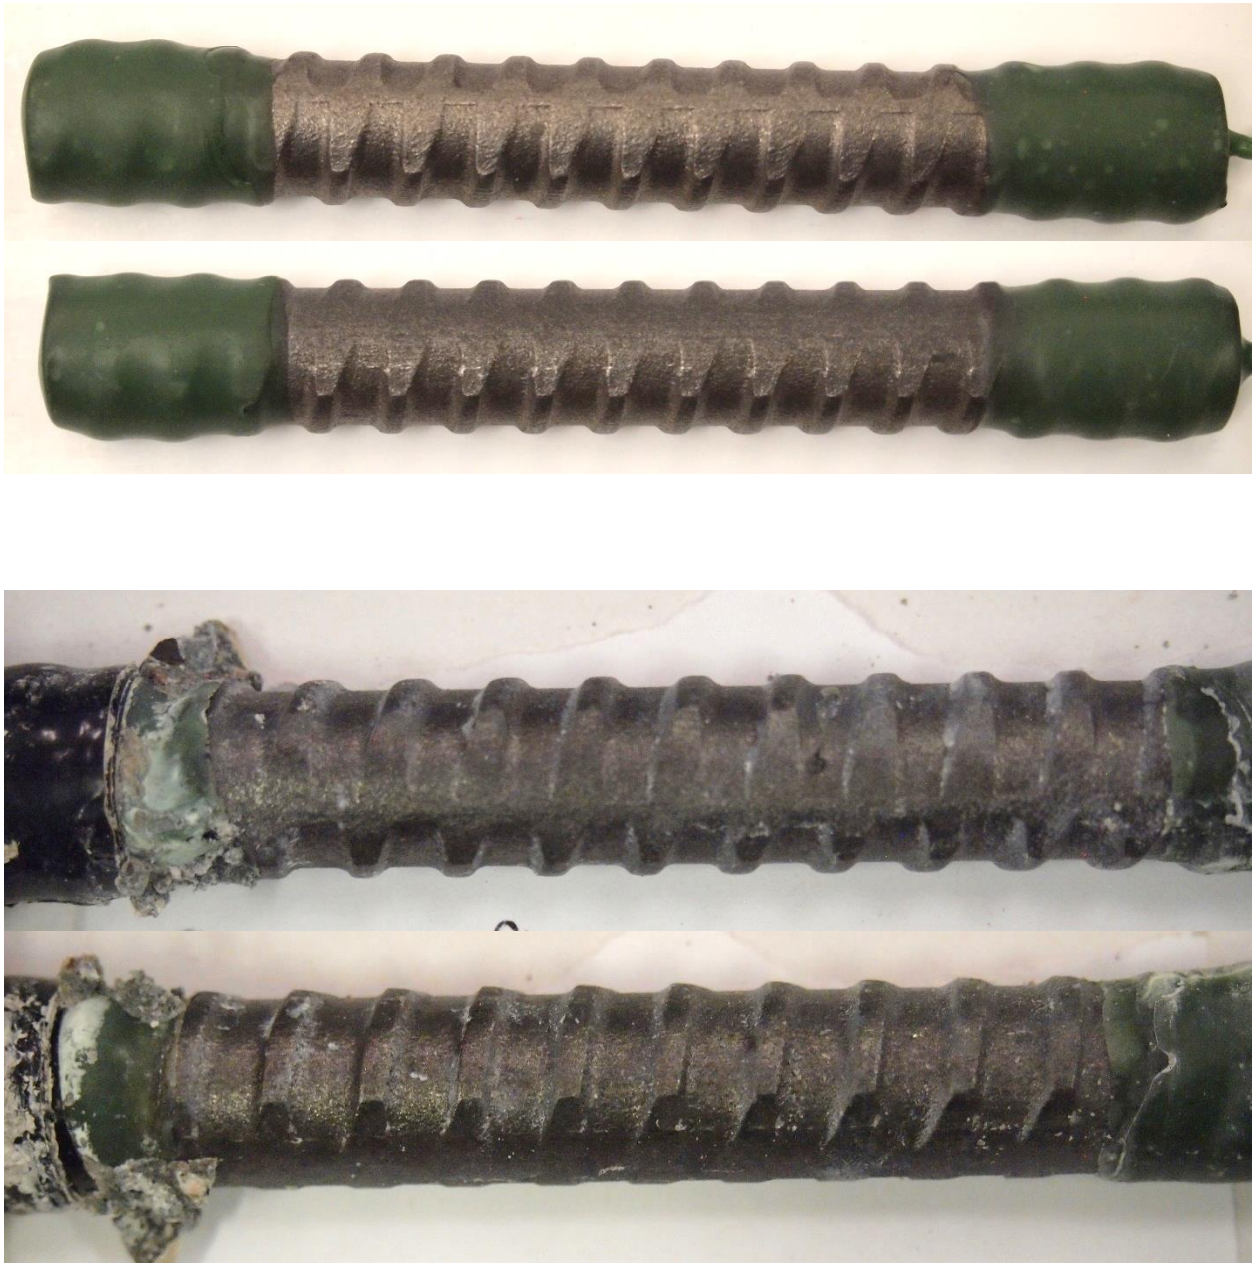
Specimen SBO-03 before testing (top) and after testing (bottom)
